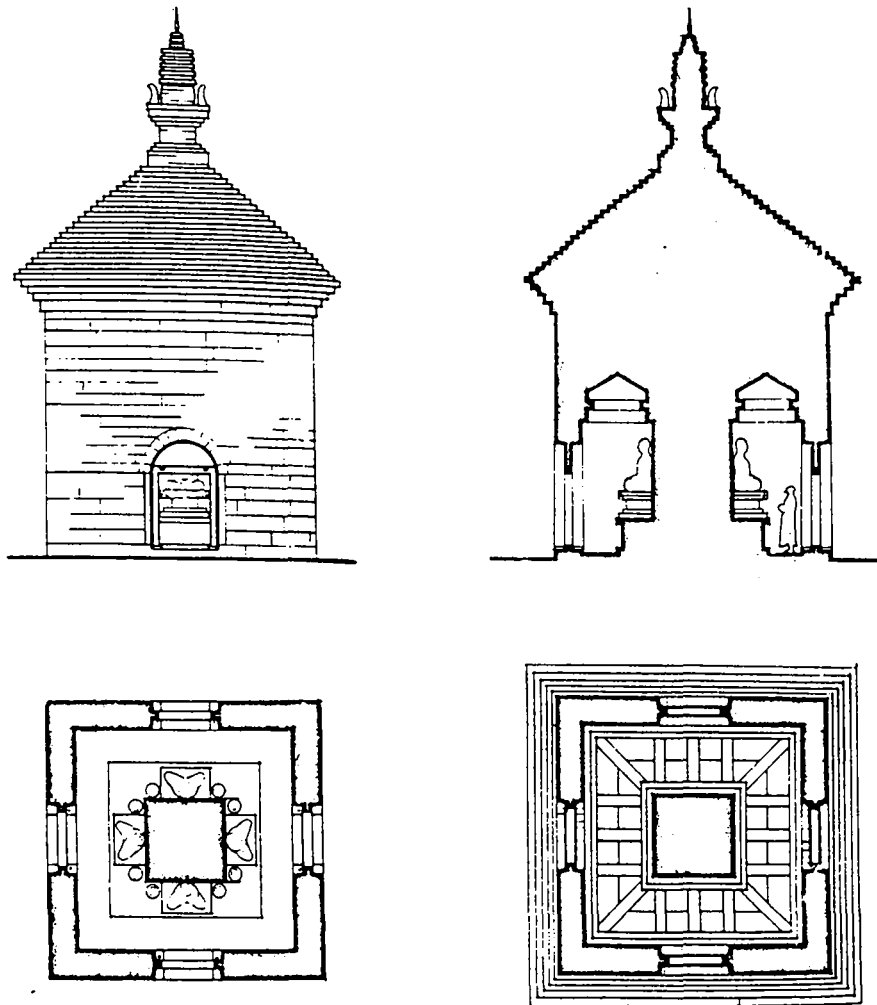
Ground and ceiling plan, elevation and section of the Simen-ta 四門塔 사문탑 of Shengtong-si 神通寺 신통사 (544 AD, scale: 1 : 200) (after: *MS* vol. 42, pl. XI)
